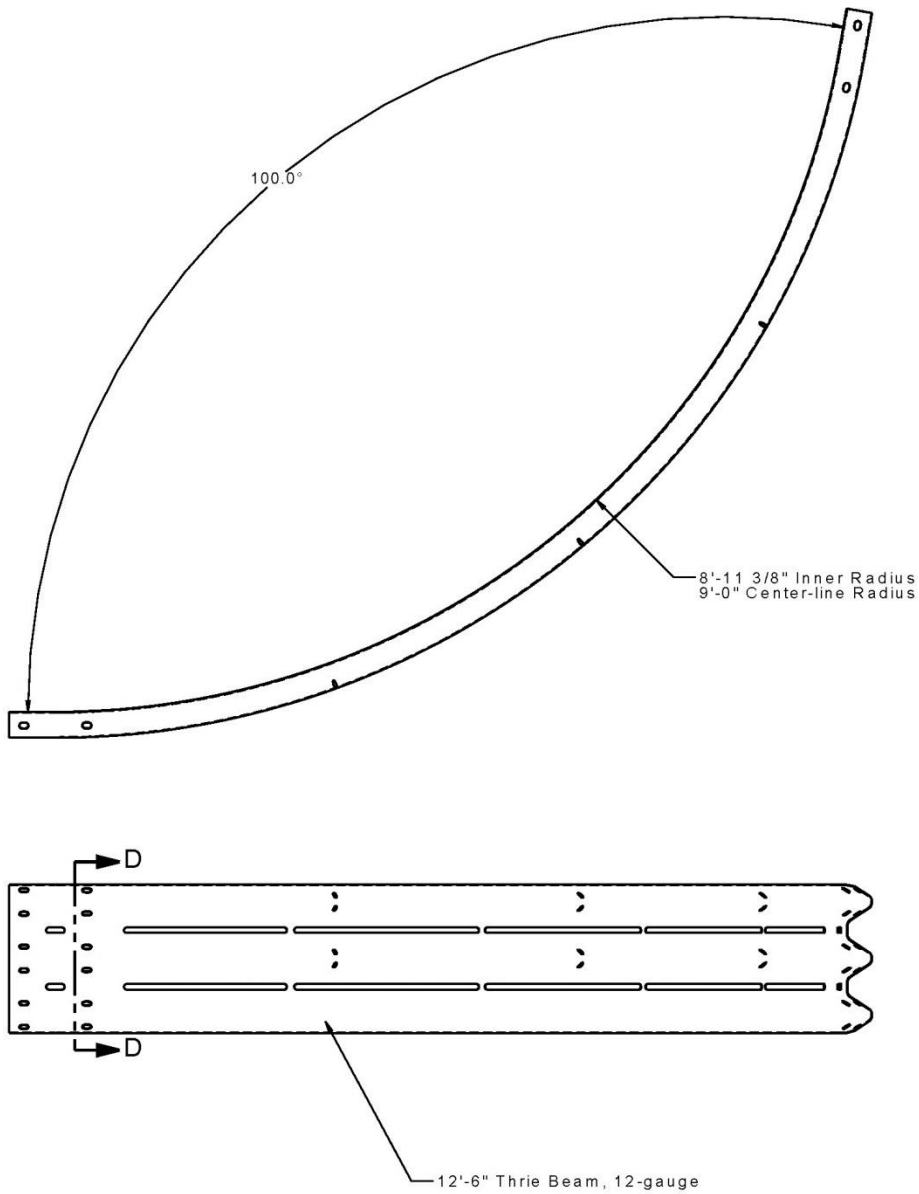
Thrie Beam Bend Details, MwRSF Short Radius Design [14]
